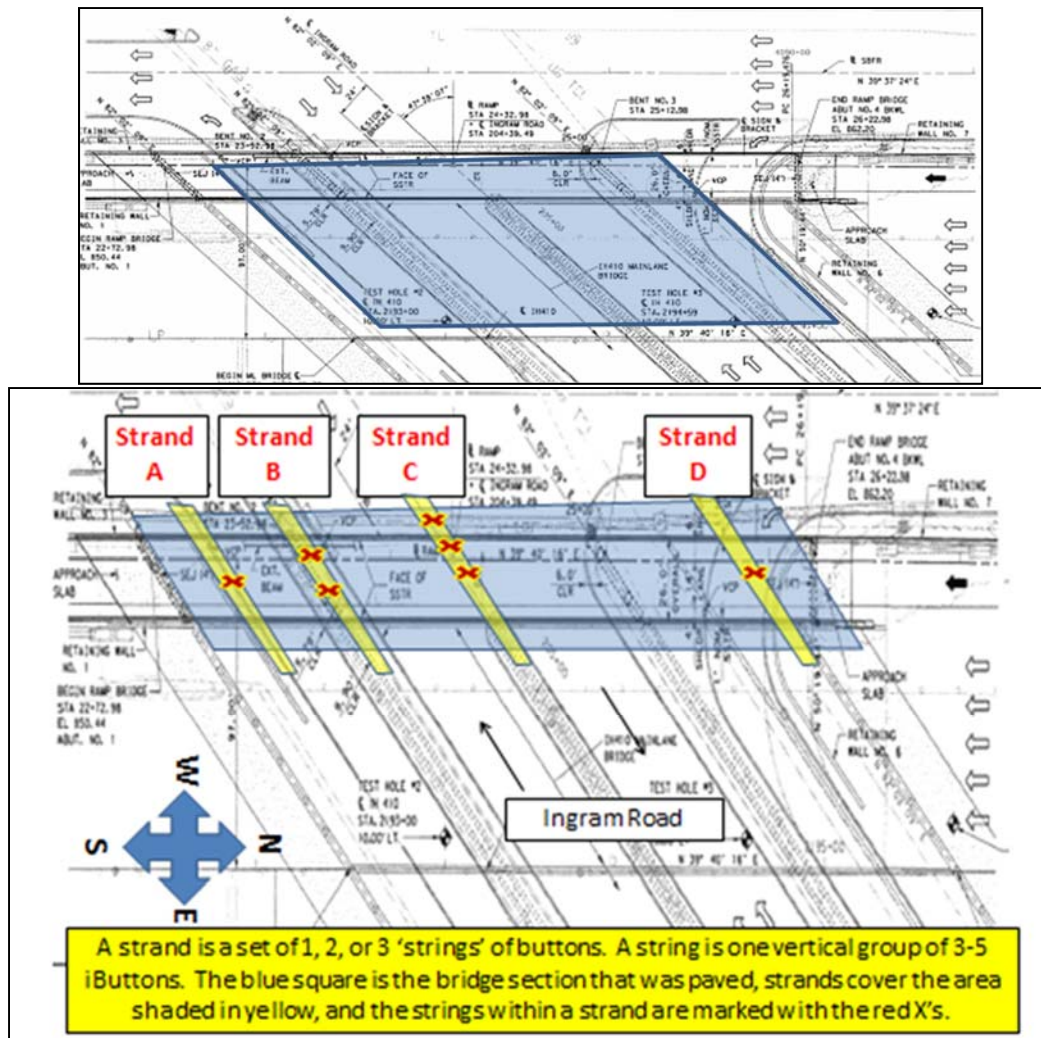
iButton strand layout for San Antonio bridge deck.
